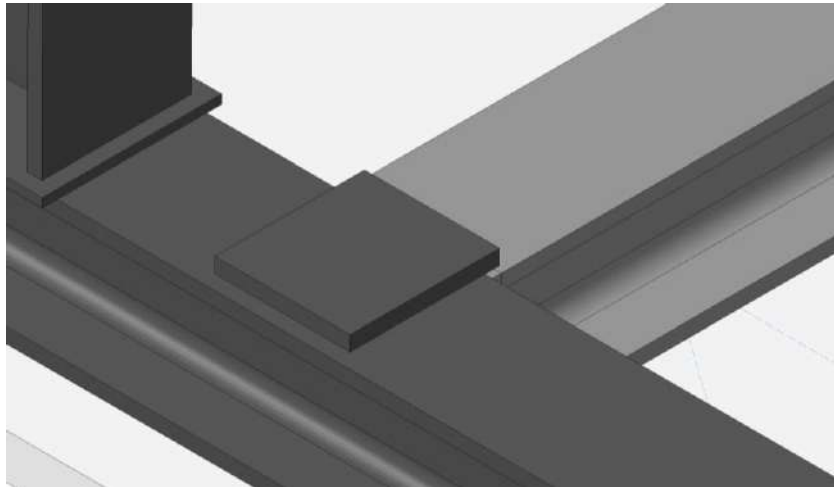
Example of a beam junction that is not supported by a foot and is equipped with a welded shear force plate instead.
